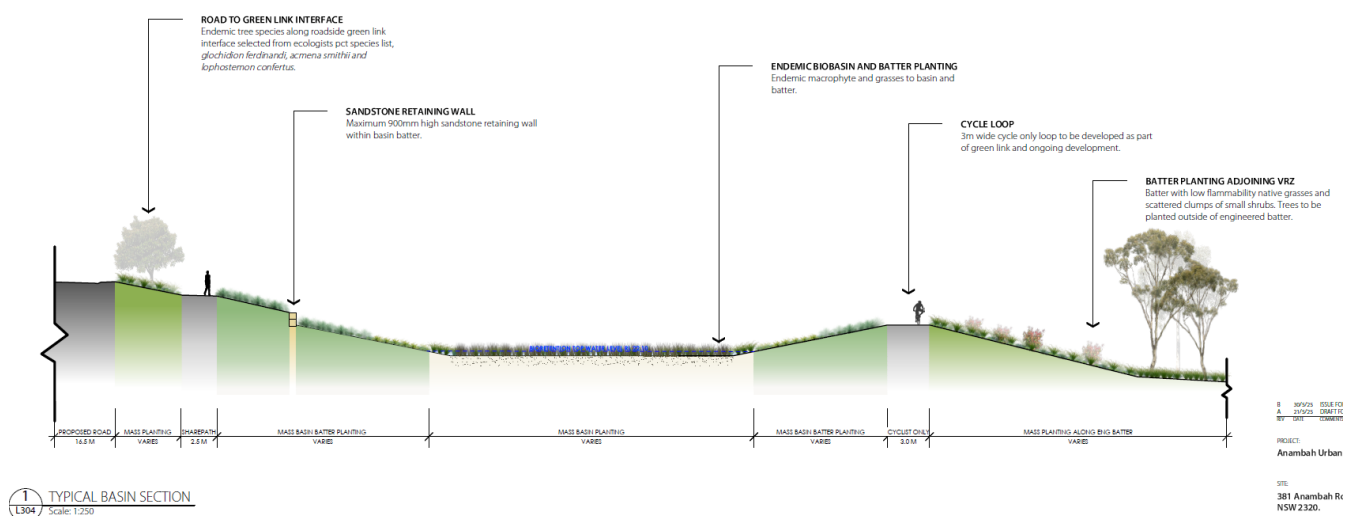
Extract of the Typical Basin Section (Terras, 2025)
